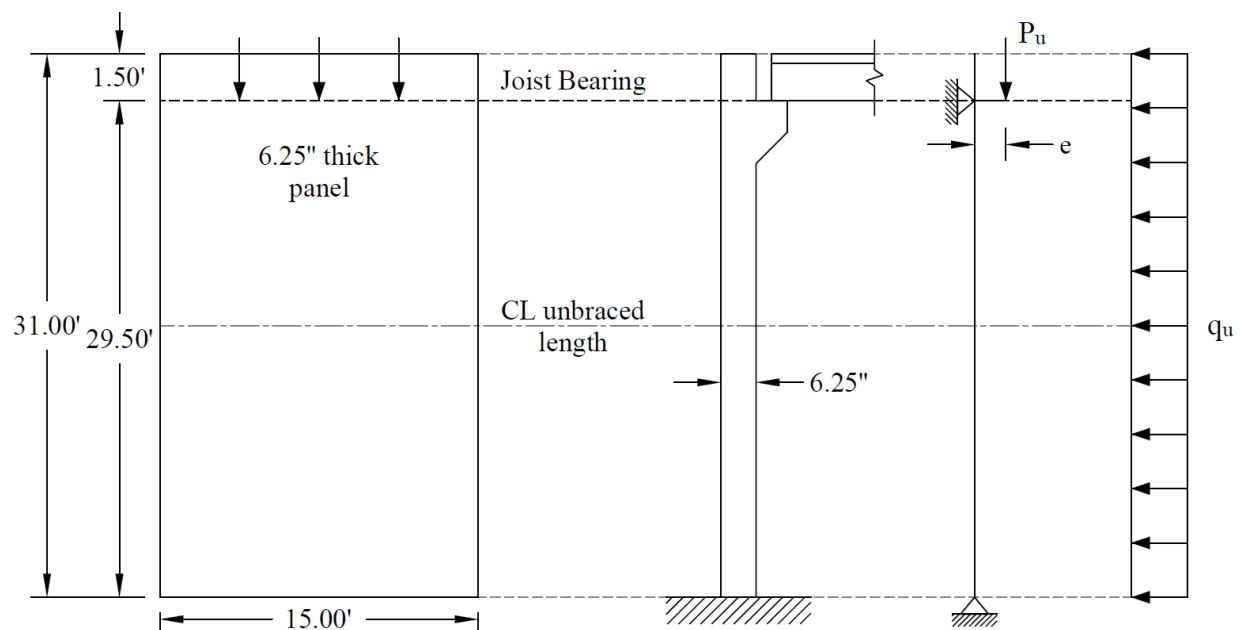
Reinforced Concrete Tilt-Up Wall Panel Geometry
